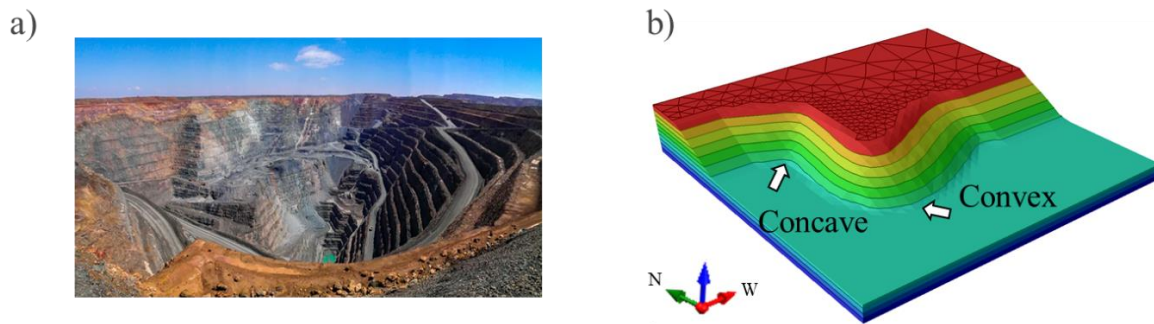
3D Effect of turning corners in pit slope stability: a) example of a real open pit mine and b) concave and convex slope curvatures
